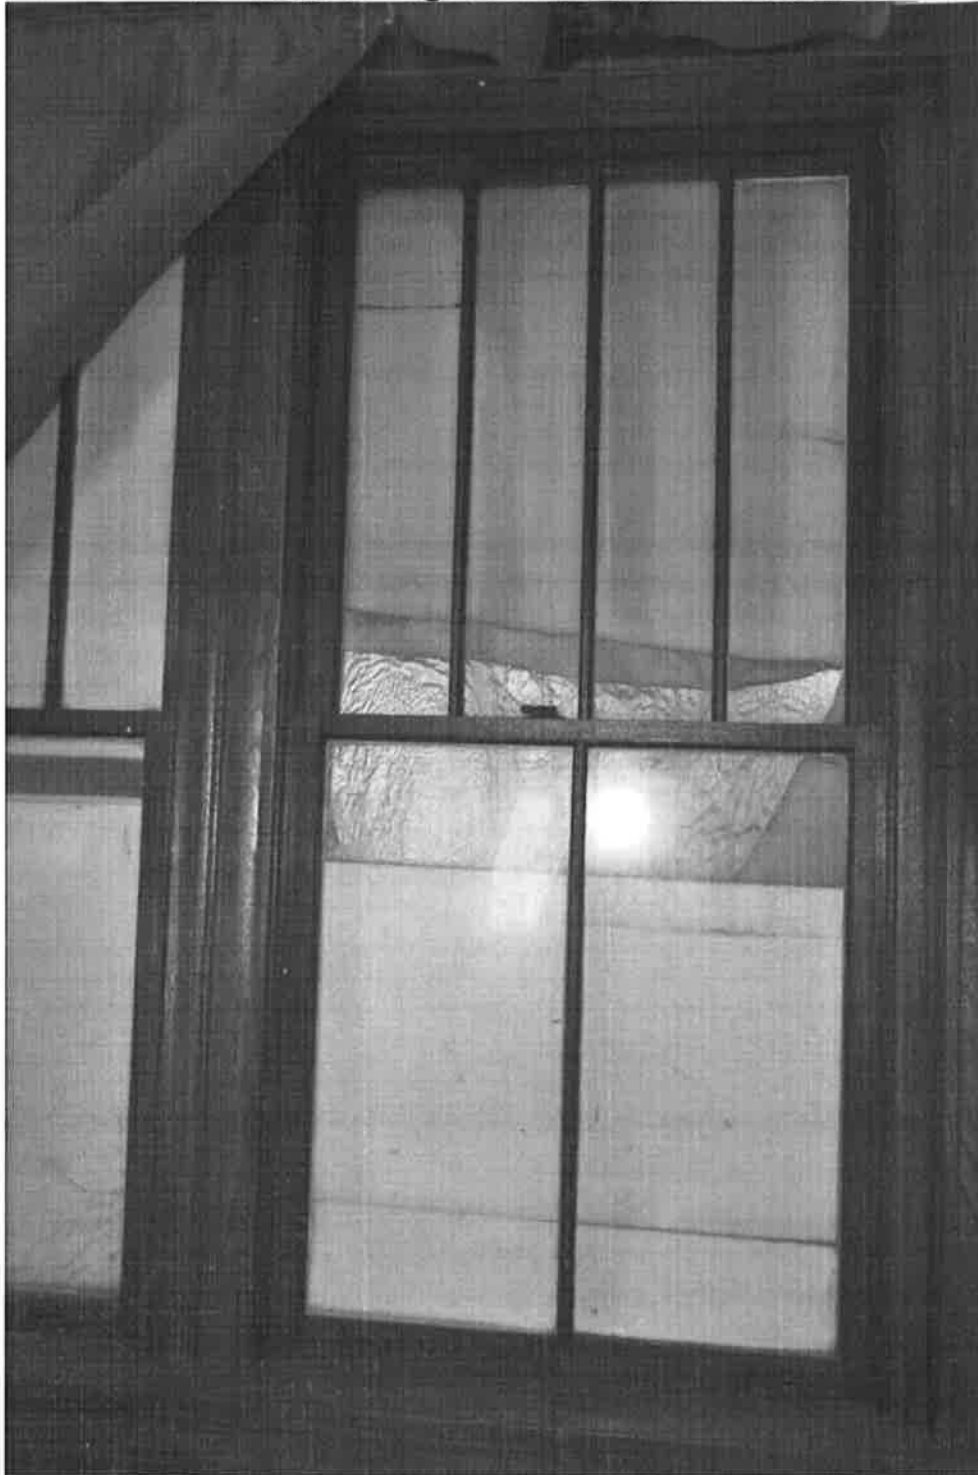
Detail of four over two window showing presence of windows inside of depot. All windows are extant, even though some have wood coverings on the outside. This style of window was typical for most C & NW standard design depots. (Photo Perry)
